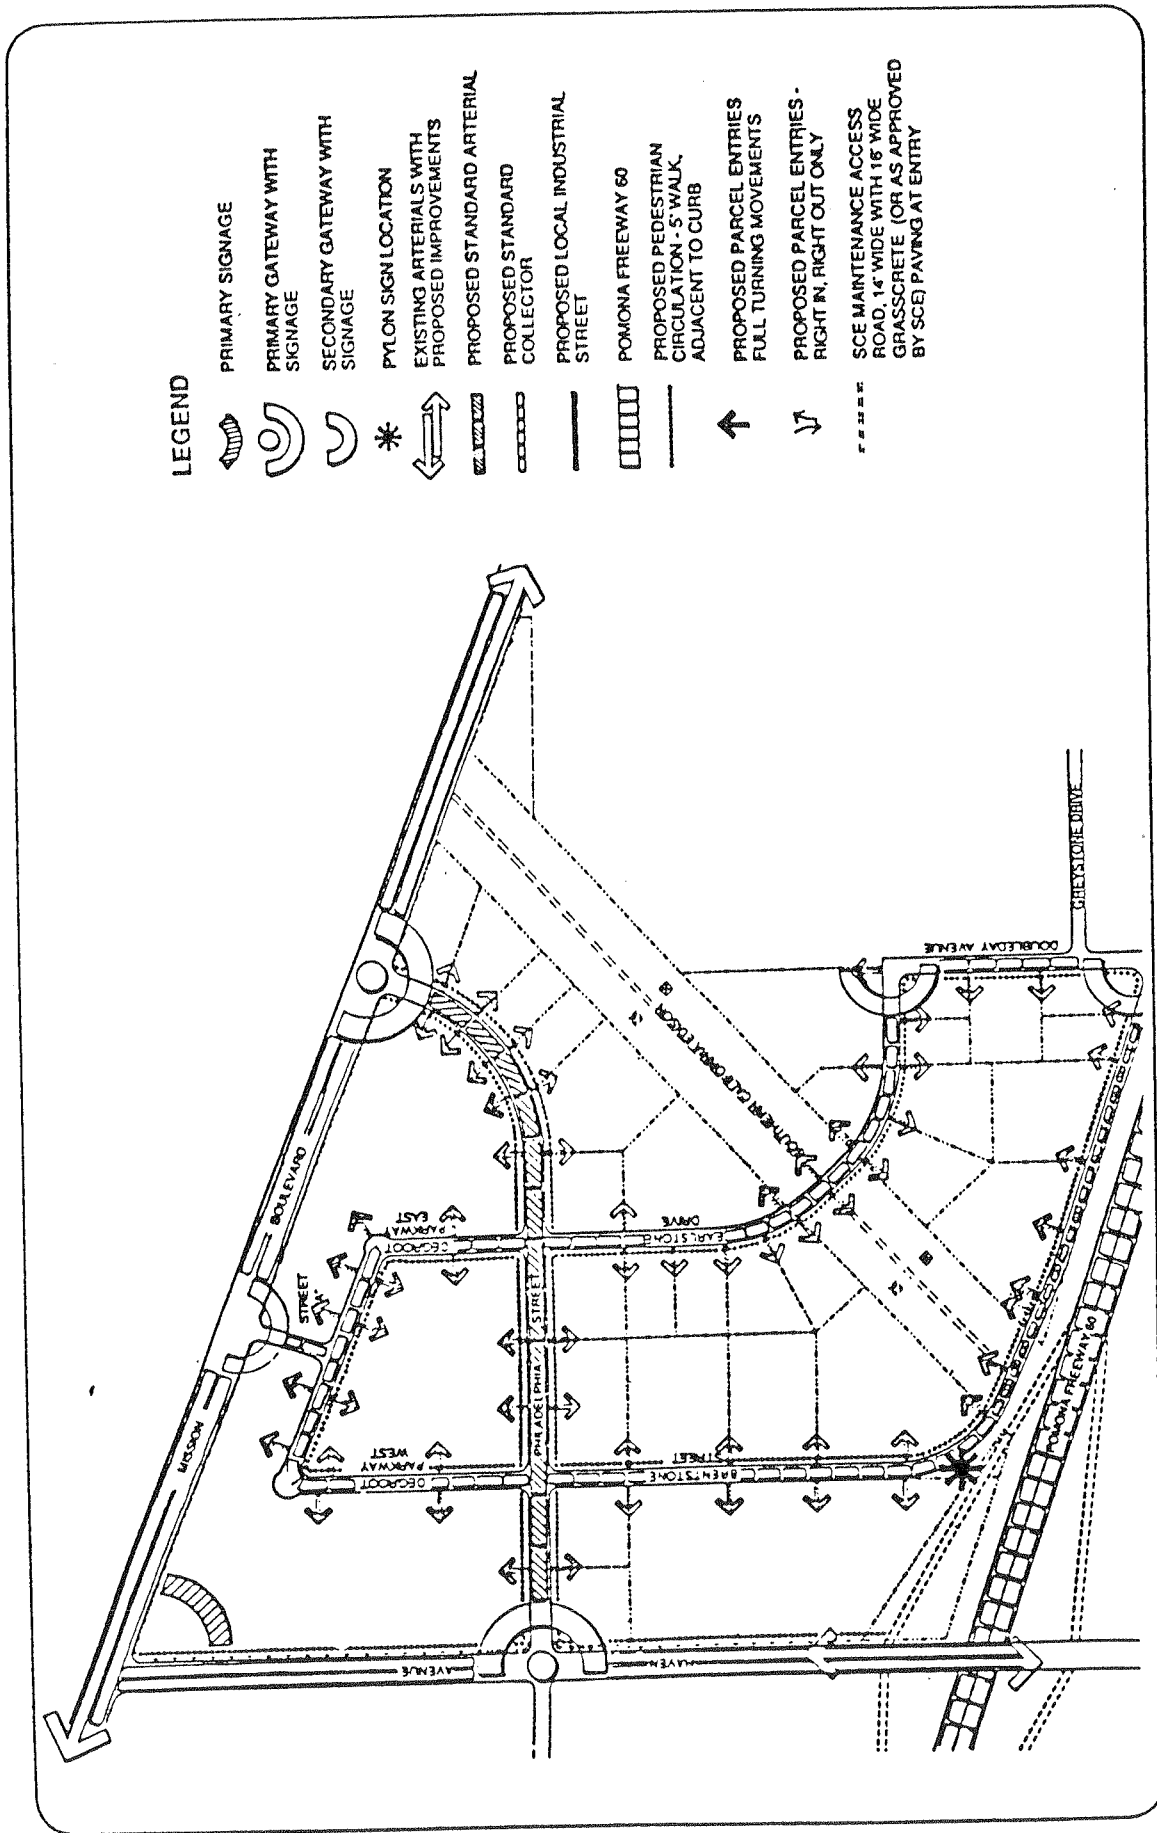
shows the proposed site plan for the Haven Gateway Center. The primary gateways to the project will be on Mission Boulevard and Haven Avenue. Access to the proposed development will be as illustrated on the site plan.
